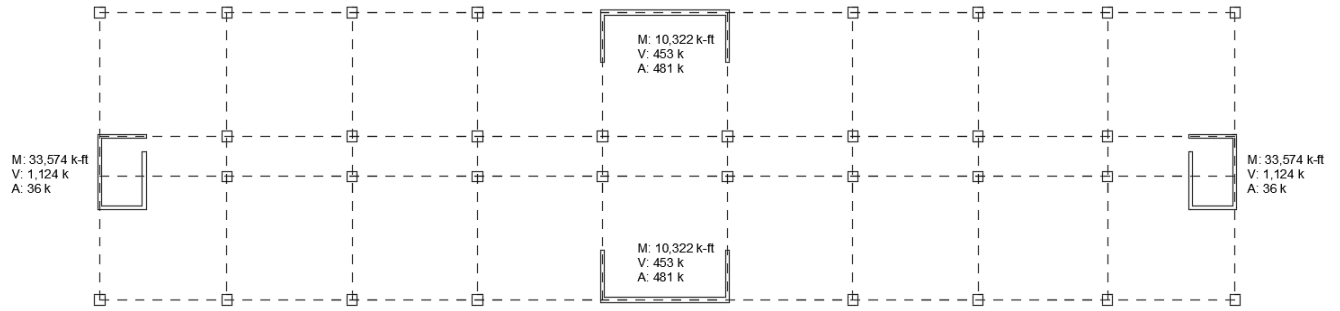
ETABS output of axial load, shear force and bending moment at the base of each structural wall 3rd floor
